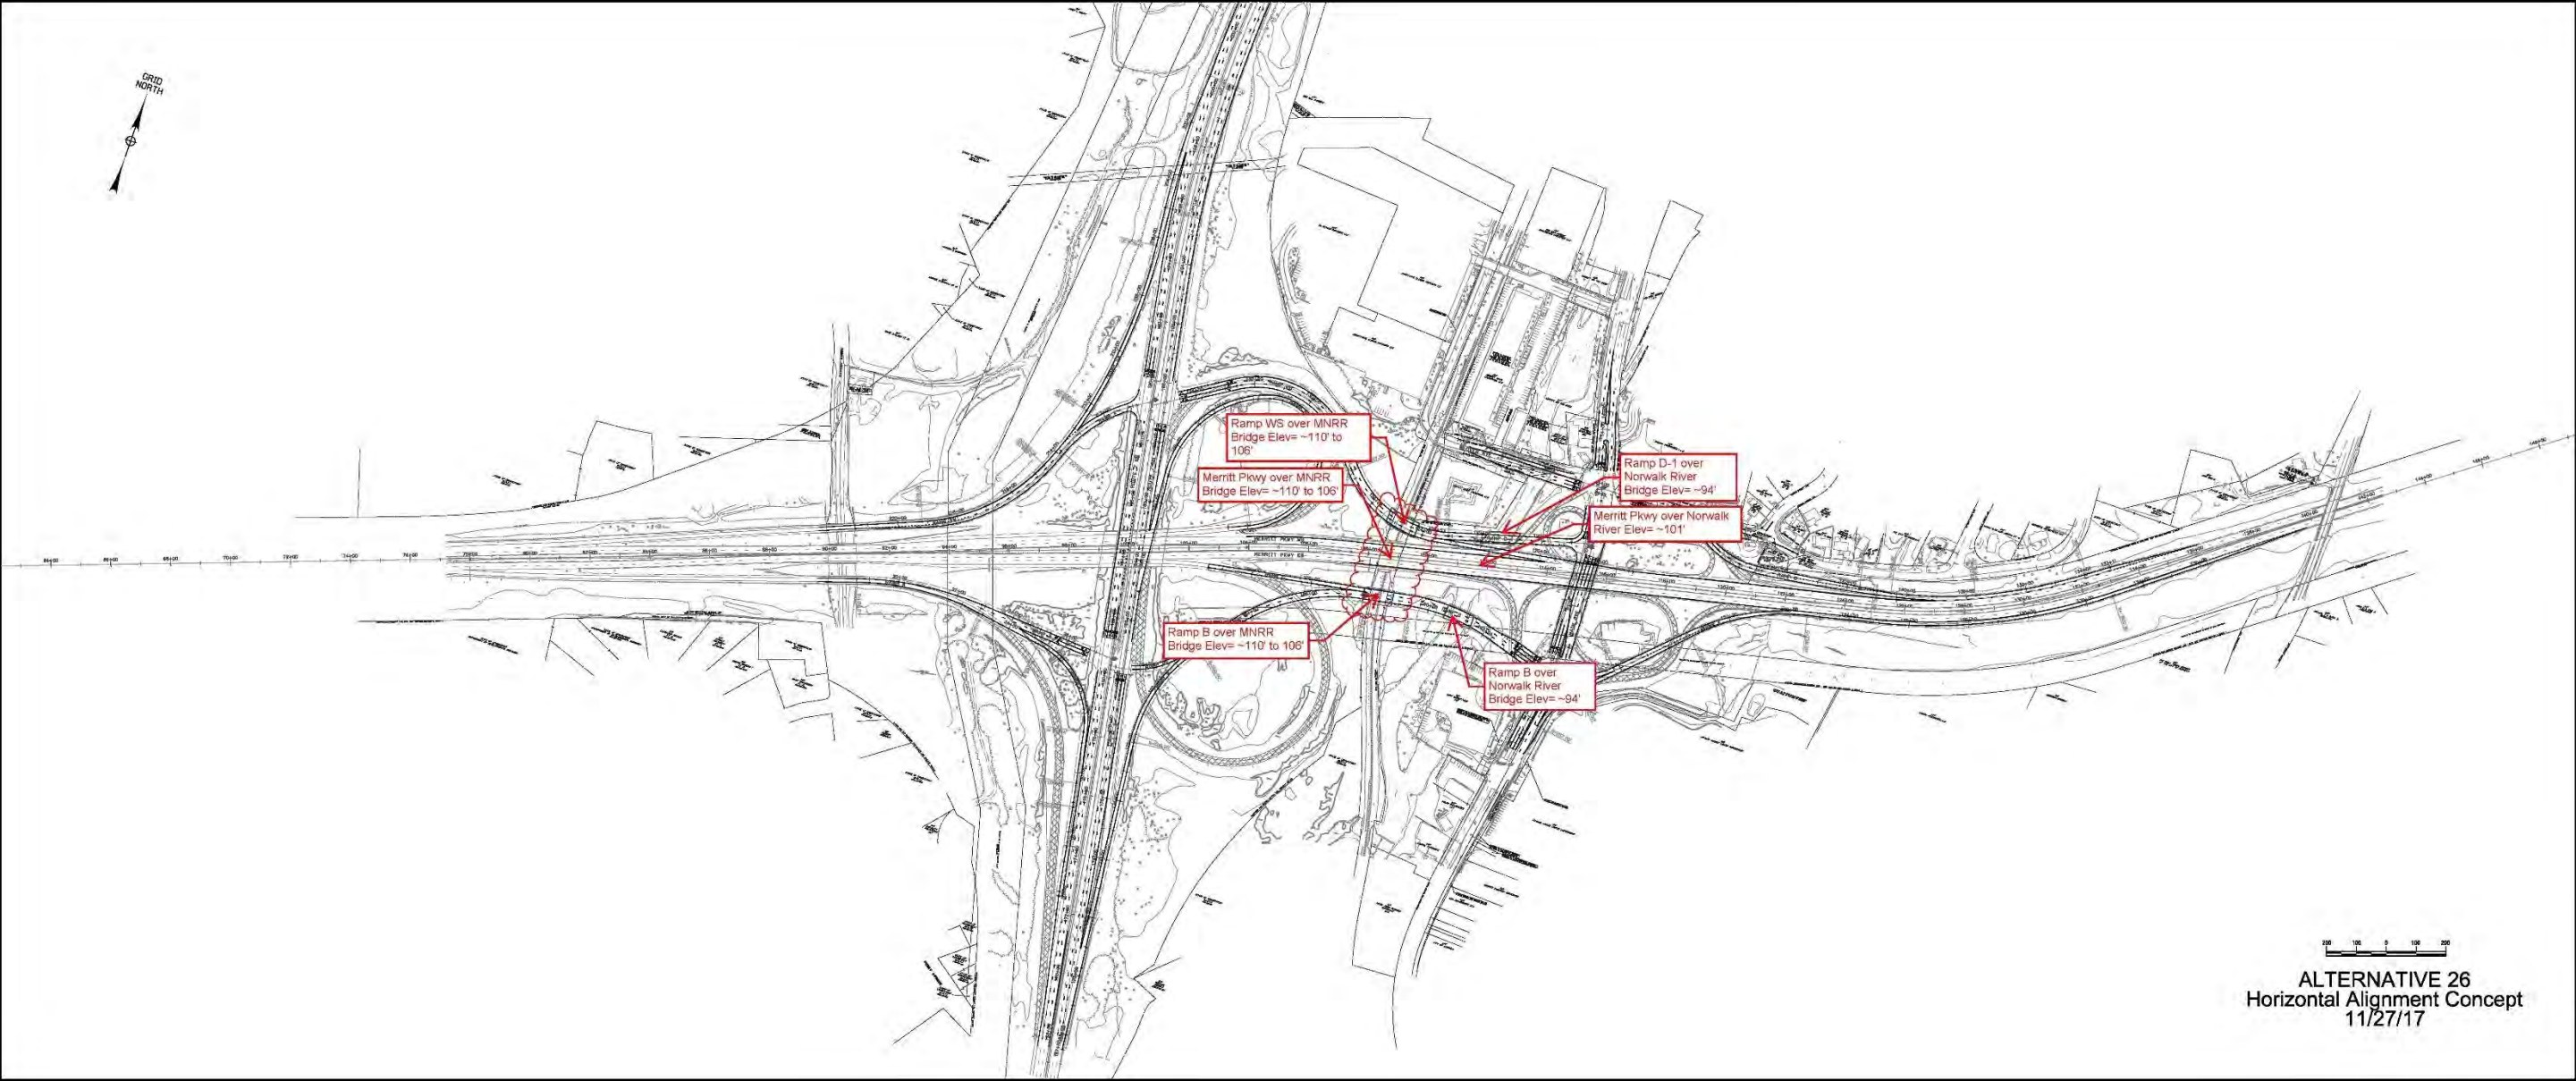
Project conceptual plans depicting elevation of Alternative 26.
